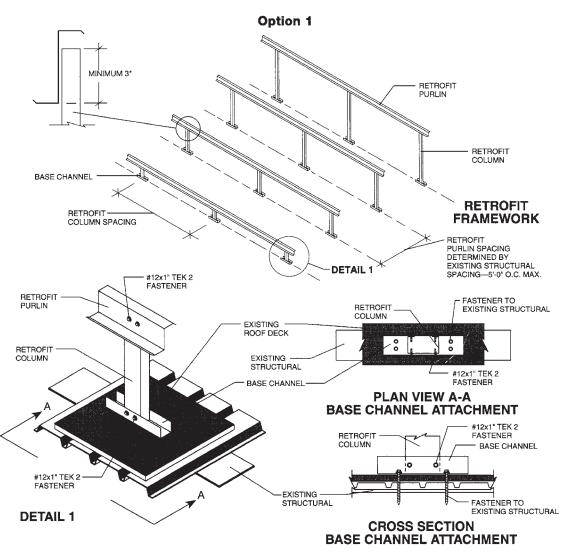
Option 1: Retrofit framing with columns located over existing roof purlins spaced not over 5 ft on centers. (MBCL)
